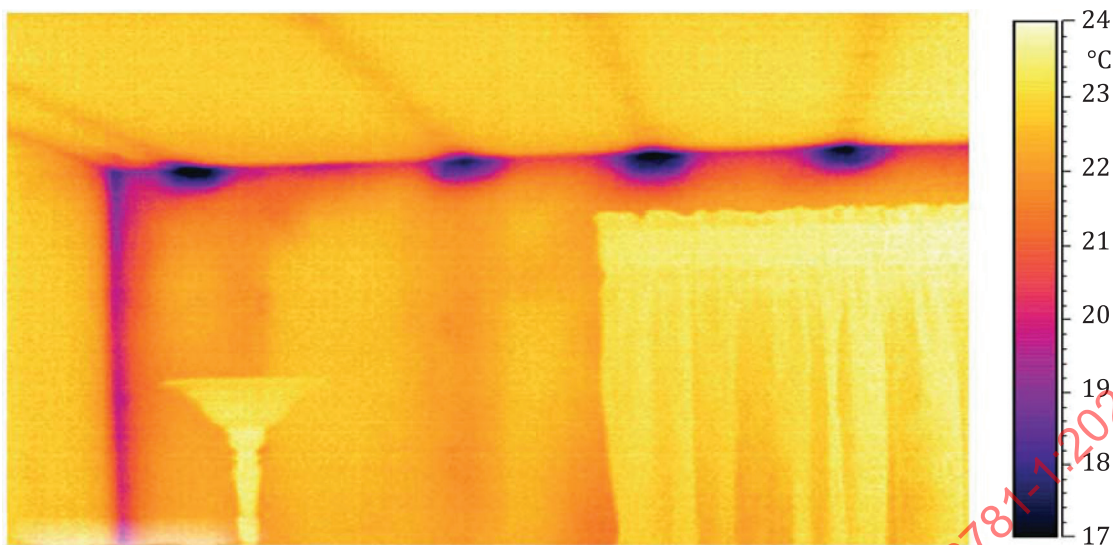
Insulated stud wall / ceiling — Qualitative illustration of joist thermal bridging and air infiltration
